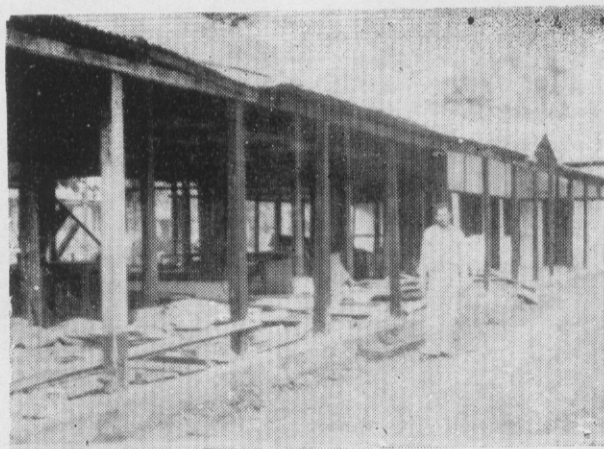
Damage to the school building at Satakarkanur-the brick masonry below window level has failed at corner and at other places as indicated.
